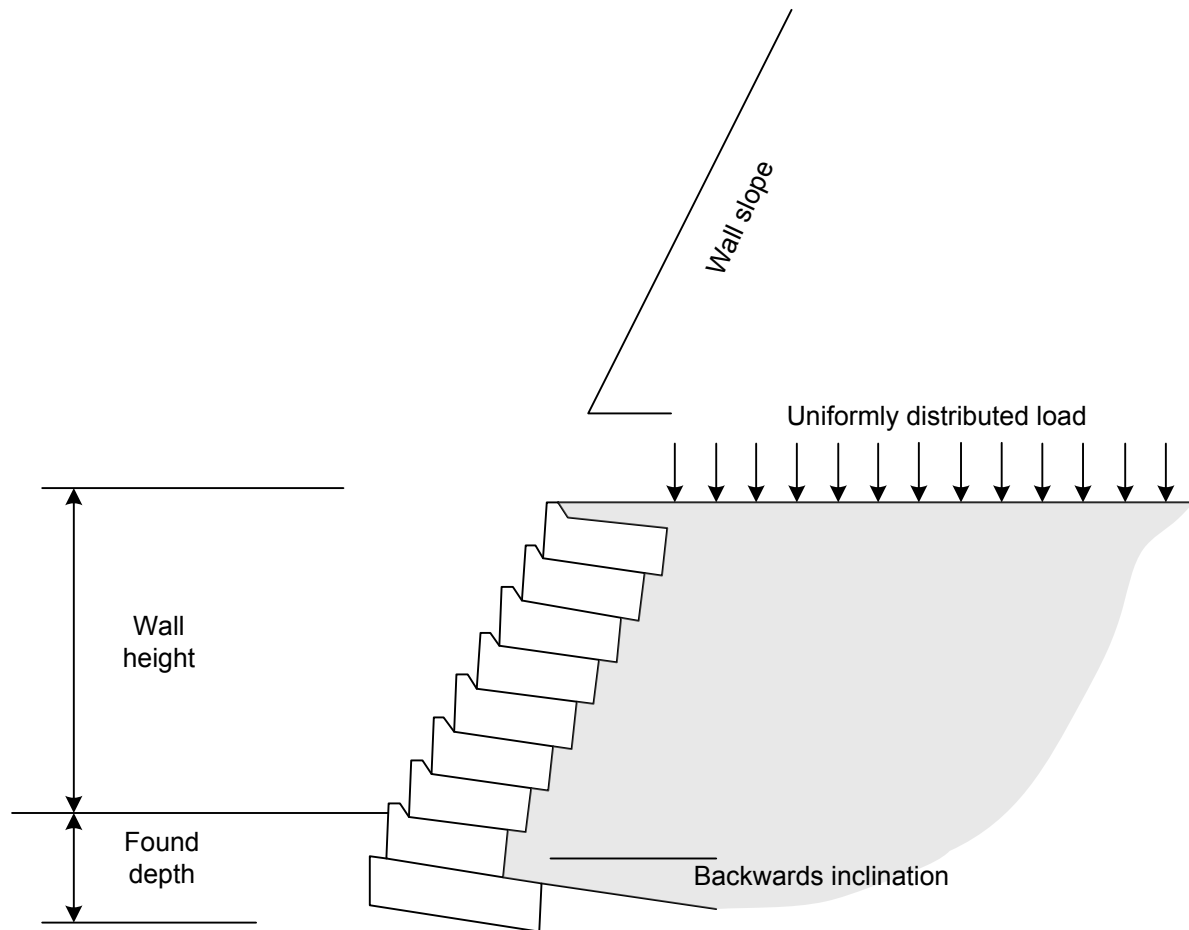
Definition of founding depth for a conventional gravity CRB wall (Clark, 2005)
